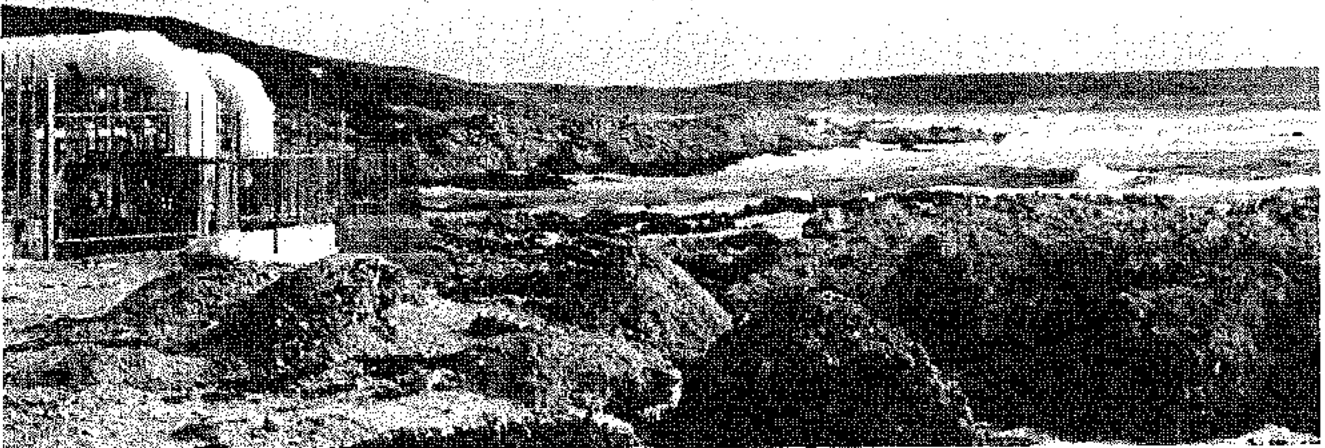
View of the rocky coastal platform, including part of existing pump station, looking south towards Danger Point
